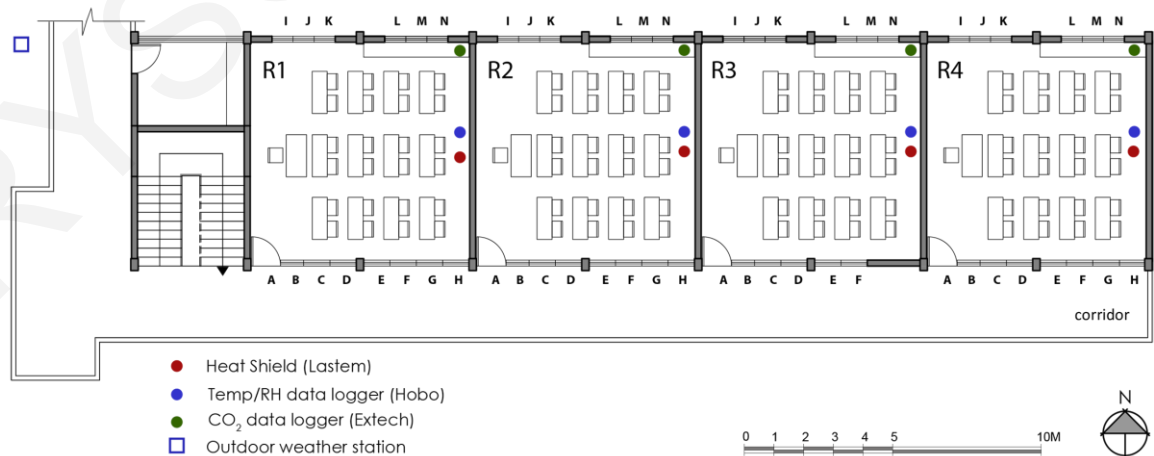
Plan layout of a typical classroom of secondary schools in Cyprus where the openings A to N, and the locations of the installed recording equipment, for indoor and outdoor environmental conditions are indicated.
